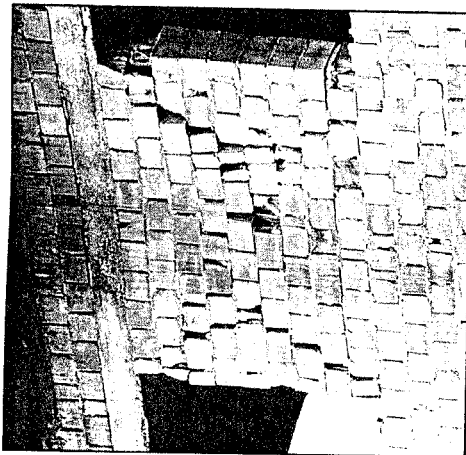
Large diagonal cracking in URM walls built with circular-cell non-bearing masonry blocks
